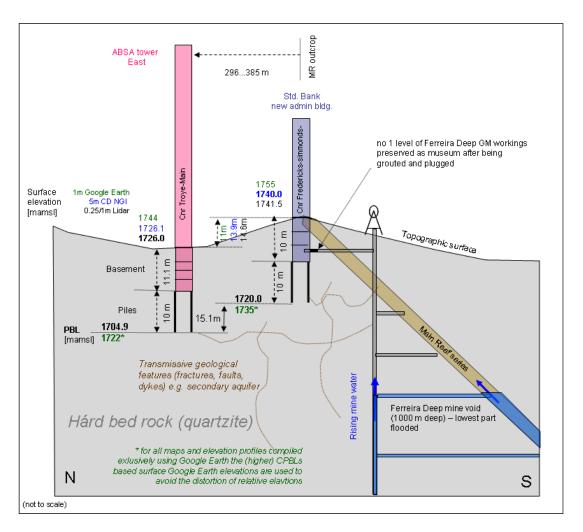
Schematic depiction of the surface elevation [mamsl], the basement depths and the pile depths for the ABSA tower East and the new admin building of Standard Bank as the two key buildings most exposed to the risk of being flooded by rising mine water.
